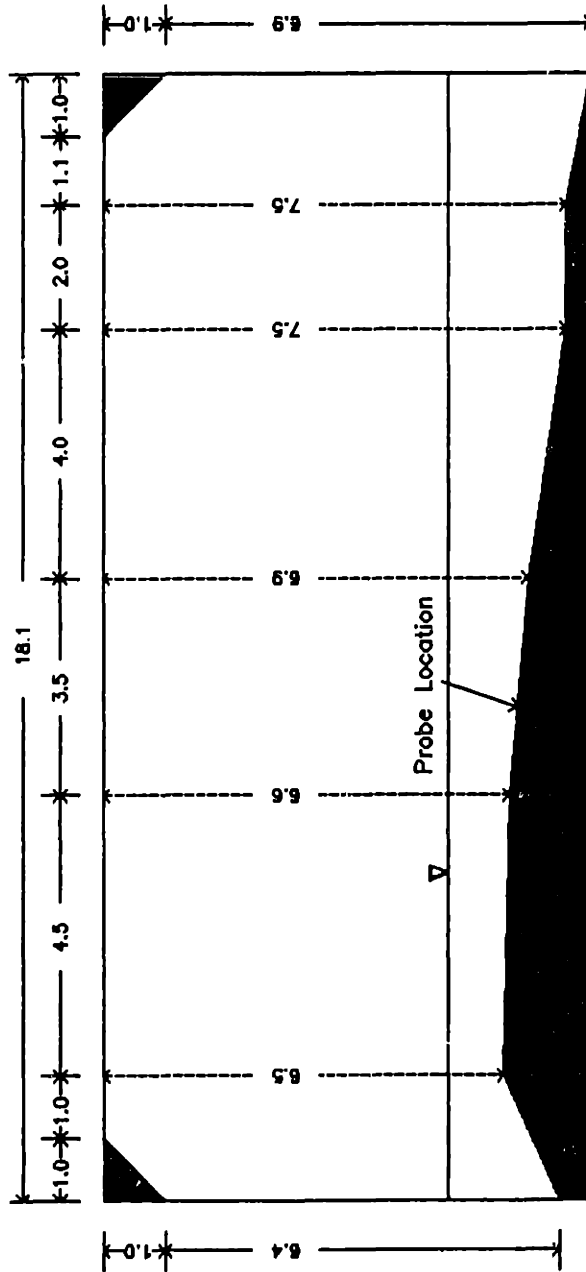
Cross-Section of Wedge Pond Outlet at the Downstream Face of the Main Street Bridge at Streamgauge Site 1.
